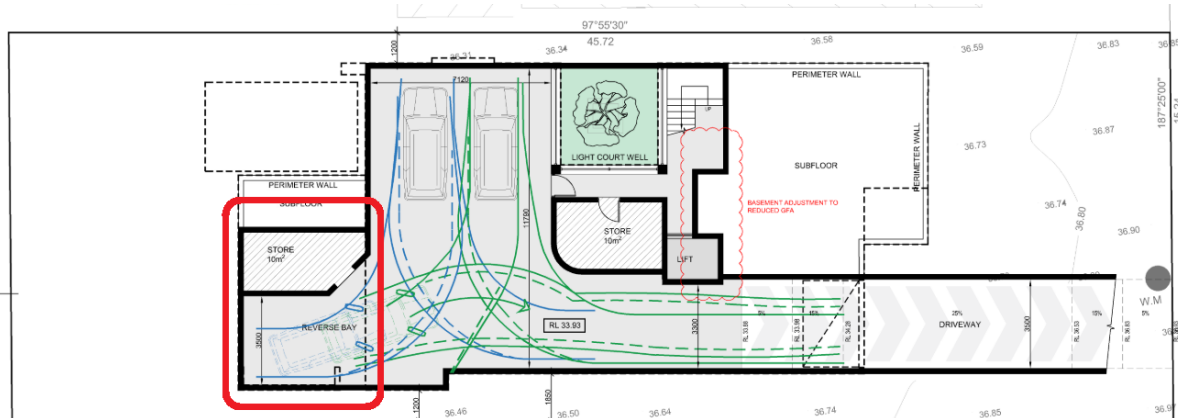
Extract of the proposed basement floor plan (source: Vision Group Architects, sheet 01 issue C, dated Feb. 2021).
